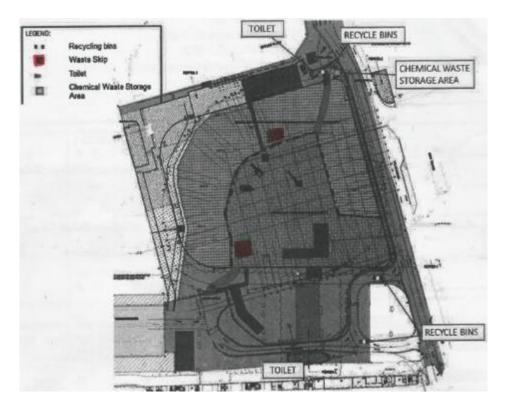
Site Plan (with On-Site Waste Storage Arrangement)
